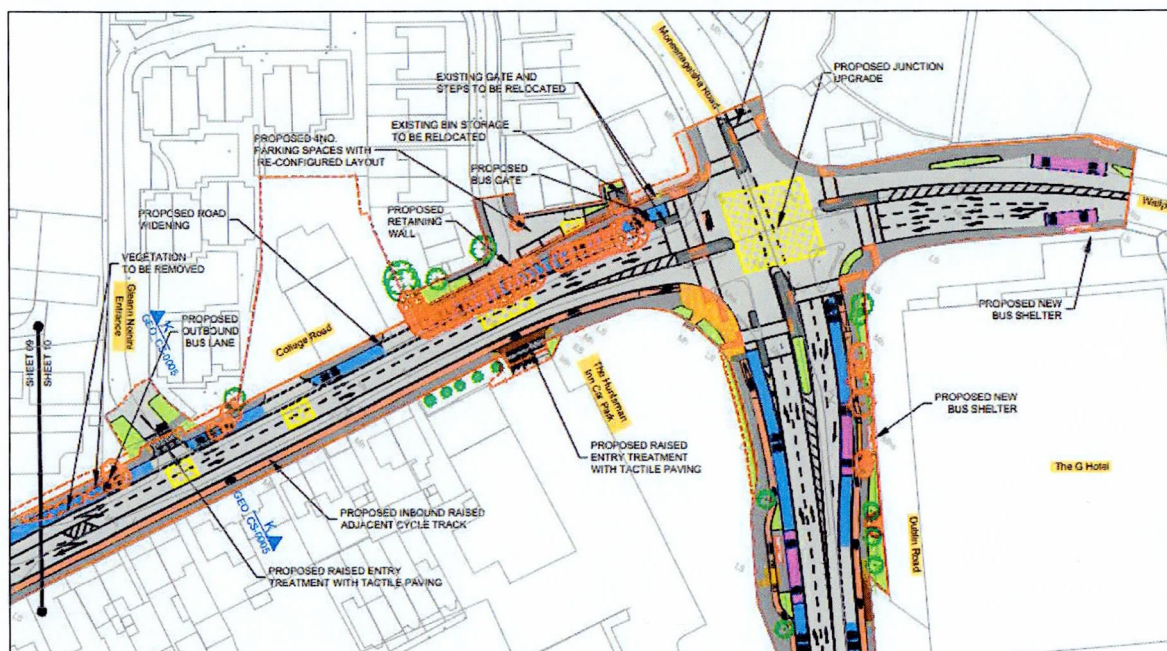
Scheme Plan for College Road. (Source: ARUP, 2022).
